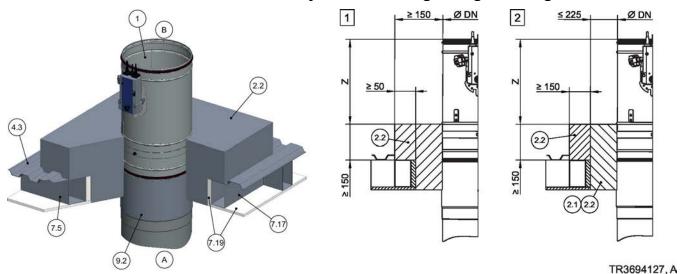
Mortar-based installation into solid ceiling slab in conjunction with lightweight ceiling (Cadolto system), shown upright (also applicable for suspended arrangement)
